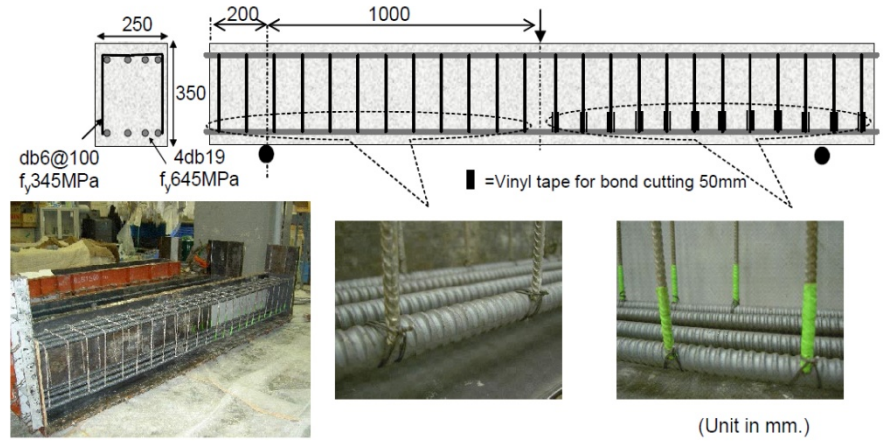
Details of Specimens (Toongoenthong and Maekawa, 2005)
